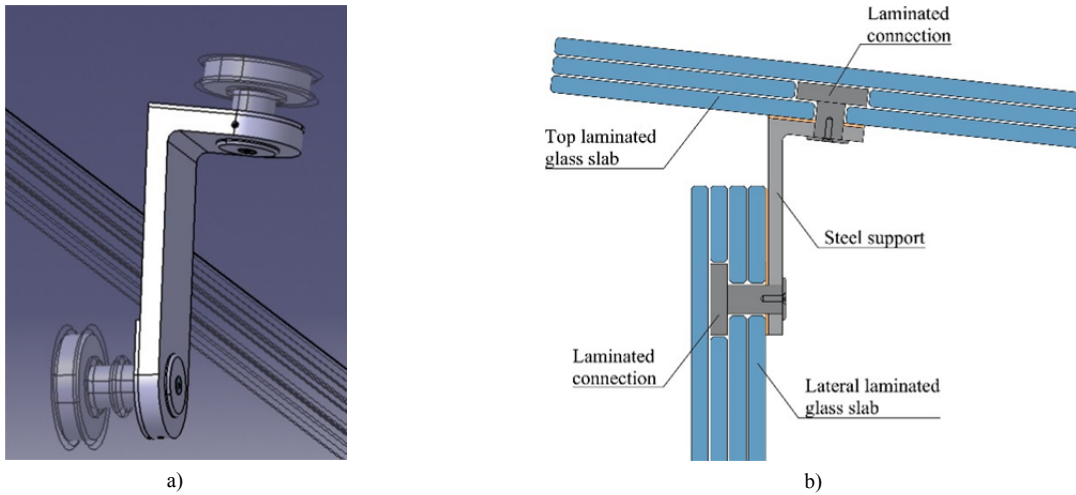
Isometric view of the roof connection, b) detail of the connection.
